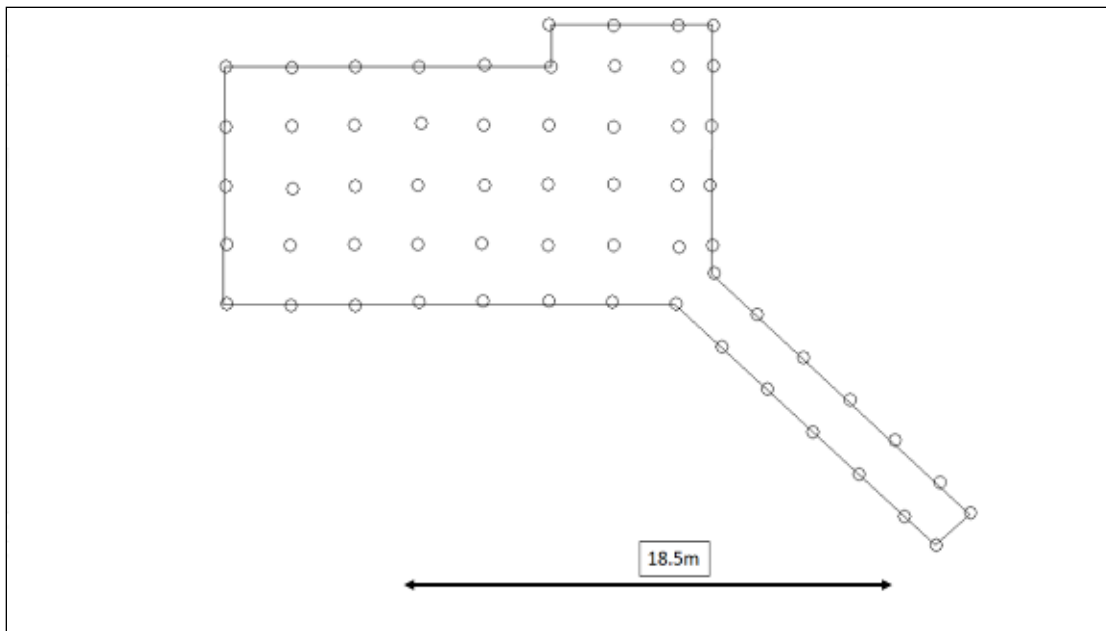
A: Pile Layout for Proposed Oasis Over-water Bar³⁰.
